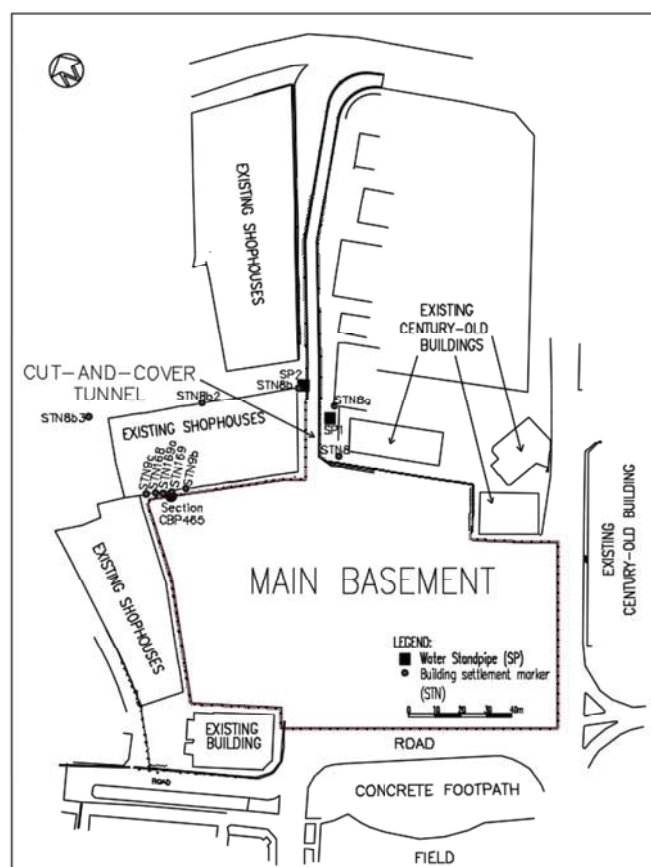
Site layout plan and locations of the cut-and-cover tunnel and main basement and the selected sections
